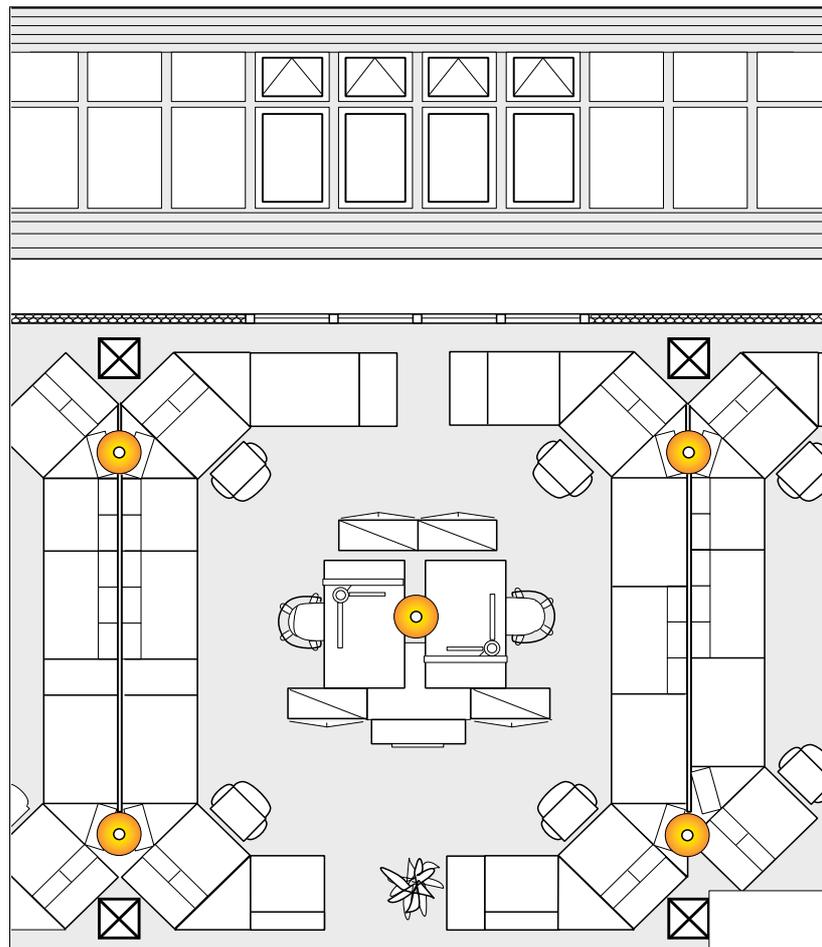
Open floor plan of the design studio (below) and view of window layout of east façade (above)
